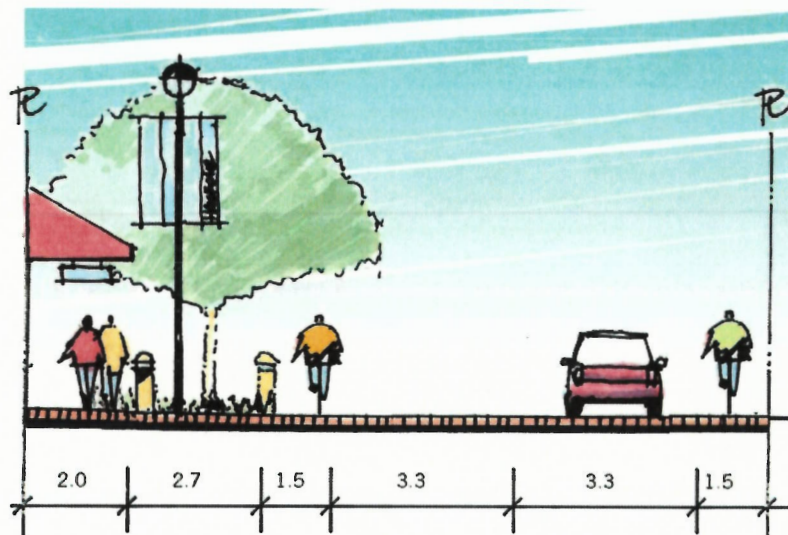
Illustrative Section across Harbour Road (Illustrating minimum streetscape widths)
